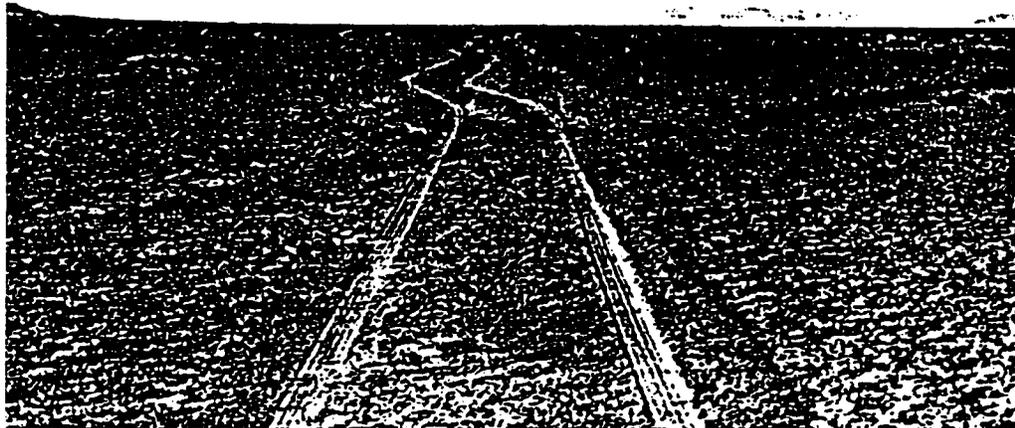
Drill Site # 20 on the eastern edge of Section 36 in the southeast quarter of the northeast quarter of the southeast quarter. looking north. Shows a barren expanse of dried mud and gravelly soil.
